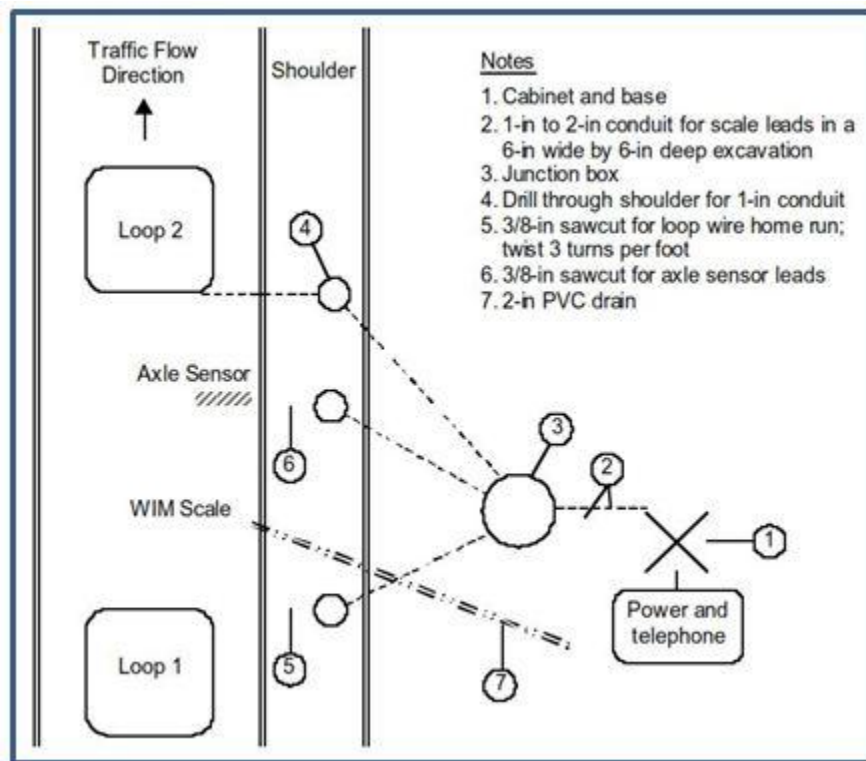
Layout of bending plate or load cell WIM system (FHWA.dot.gov).
